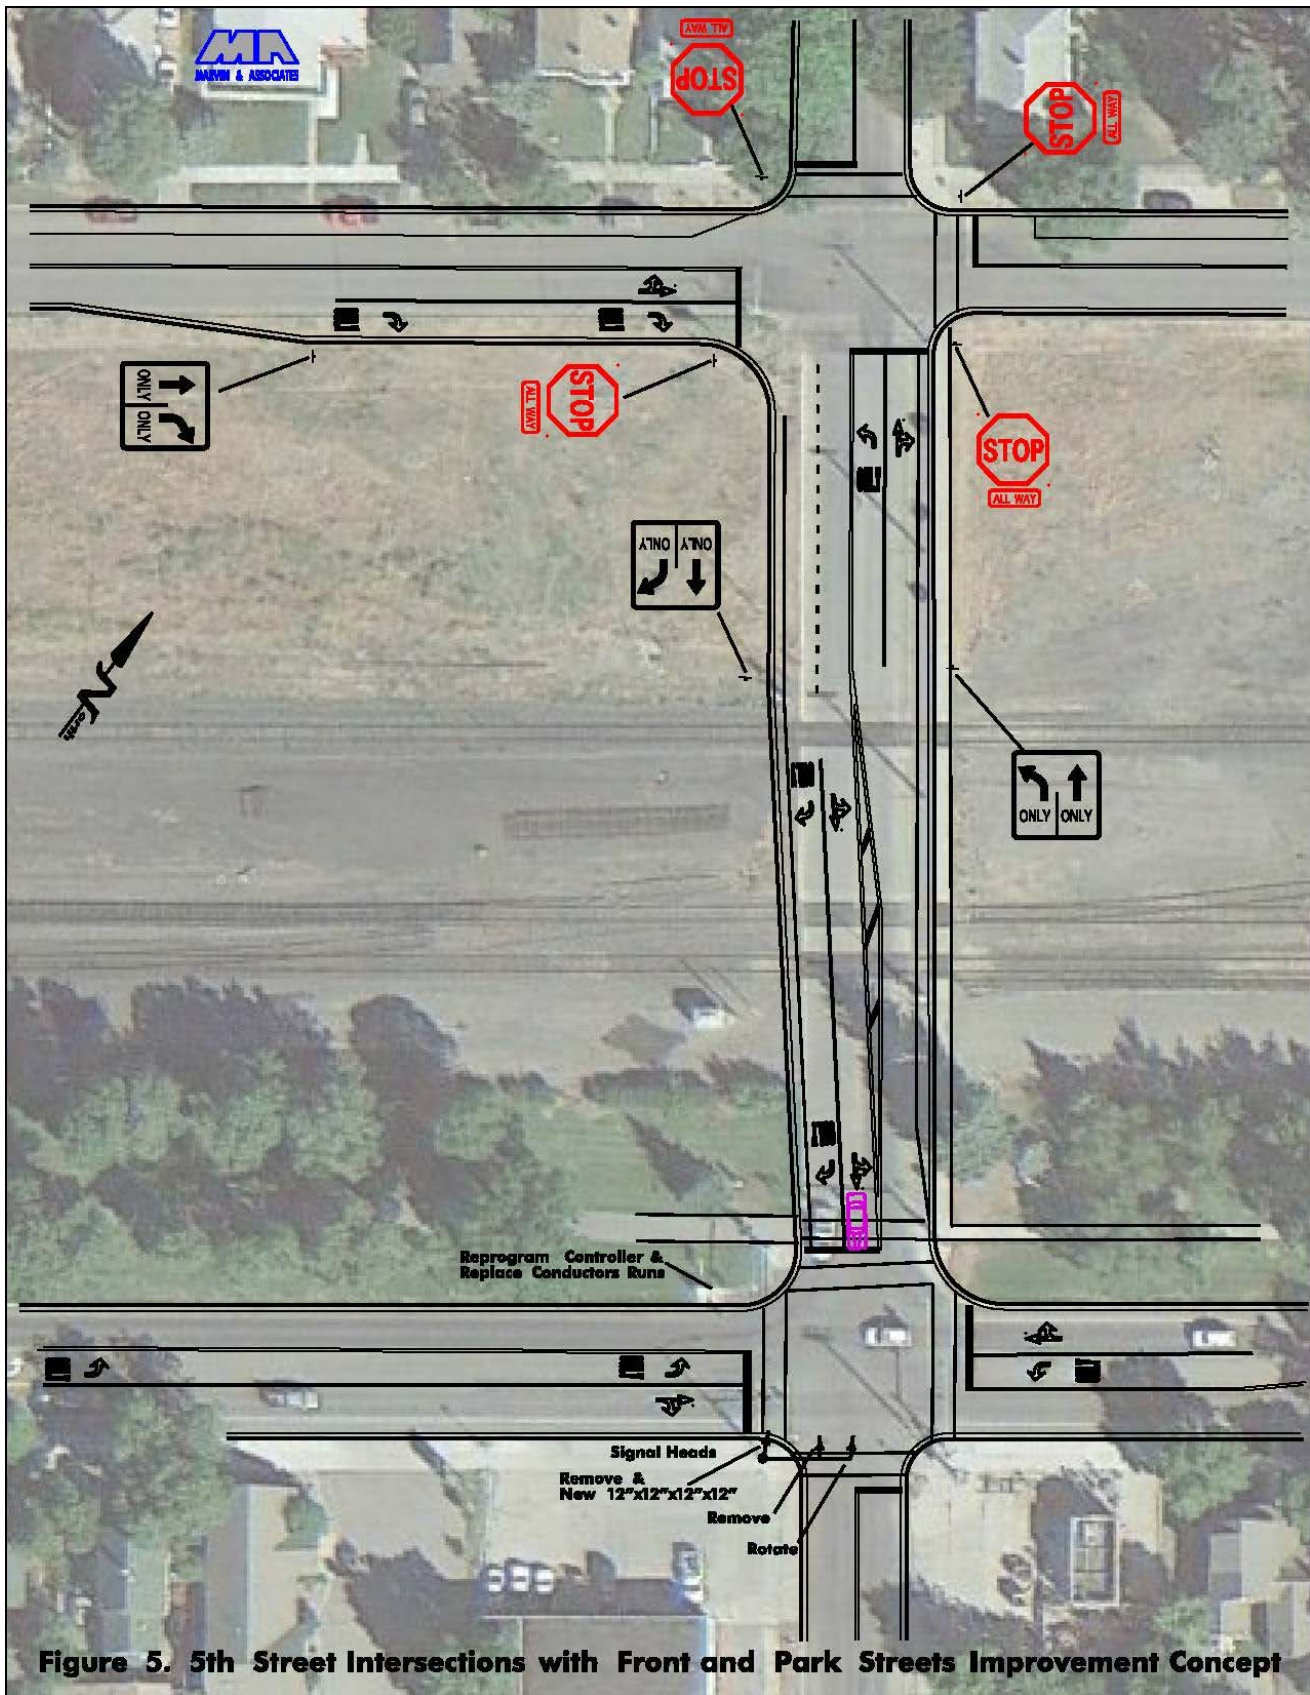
5th Street Intersections with Front and Park Streets Improvement Concept
